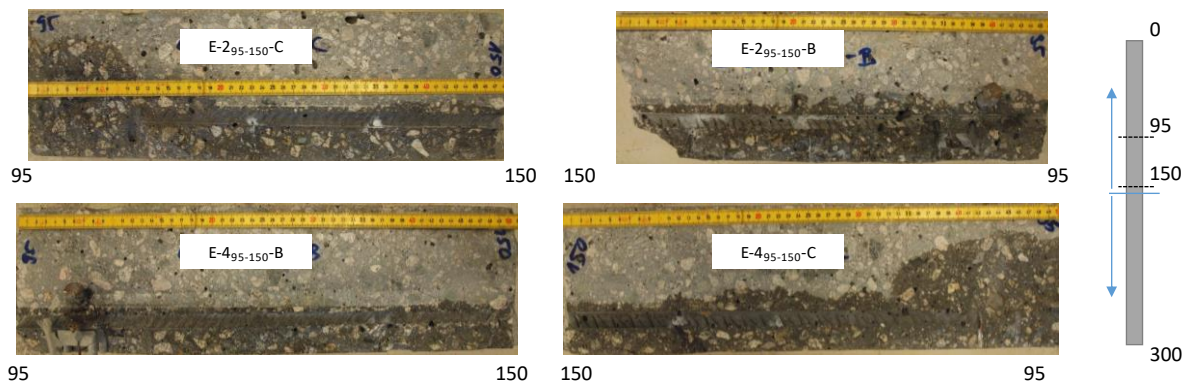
Steel-concrete interface of beam E section 95 to 150 cm. White precipitate at the cracks and spread over the steel-concrete interface. Localized corrosion at the spacer and a crack
